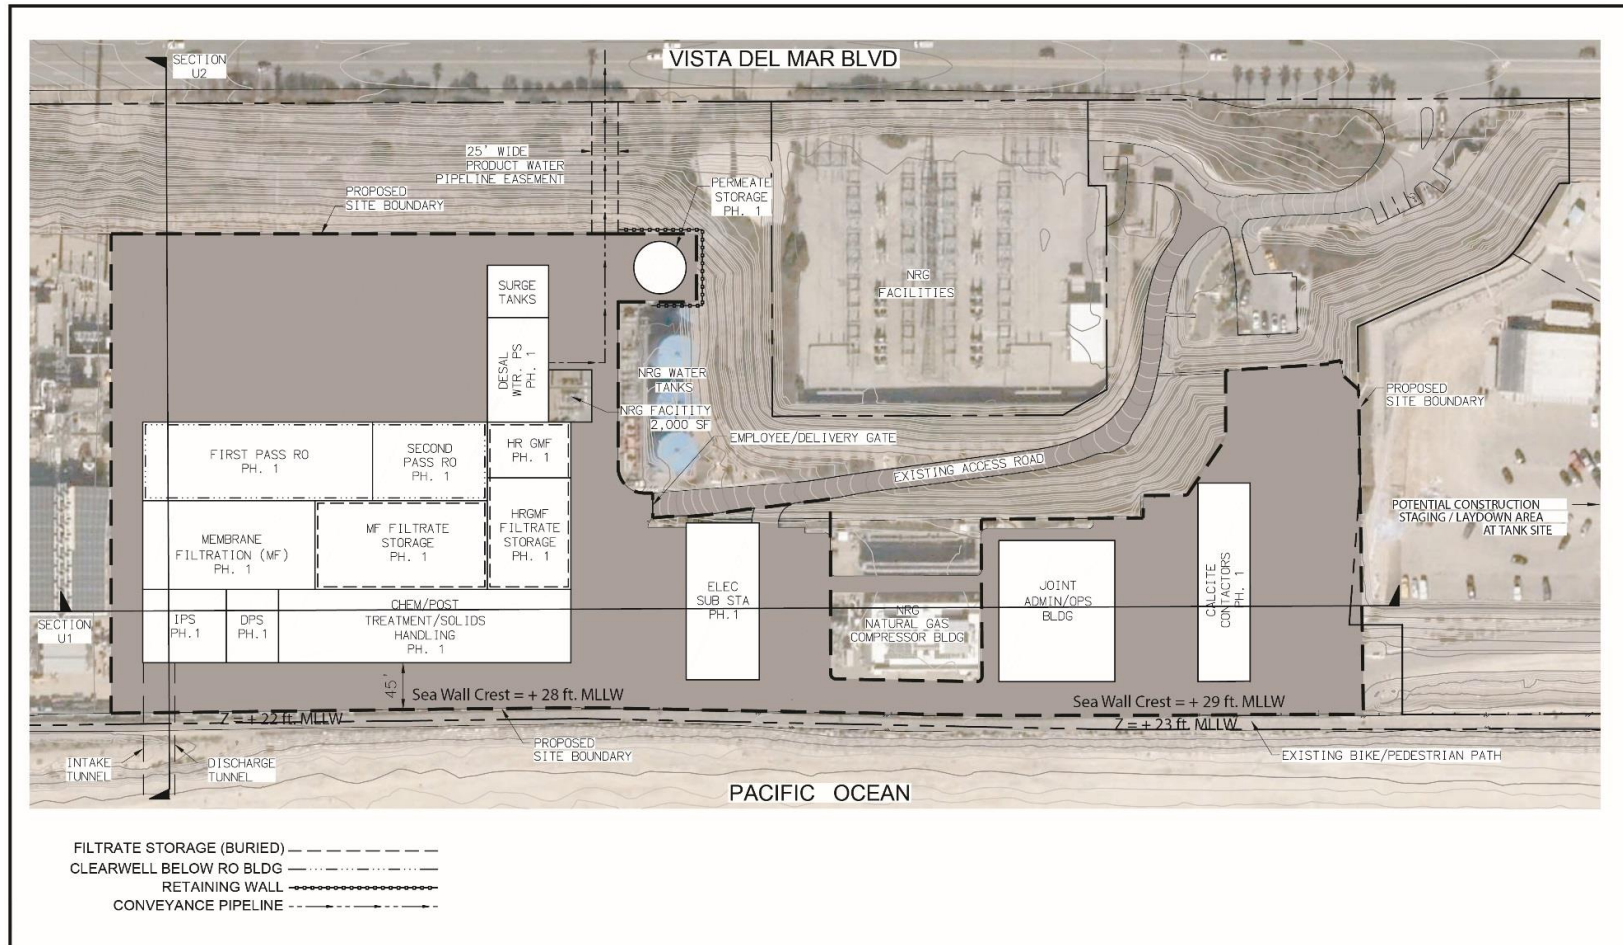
Component layout for the 20-mgd scale West Basin Desalination Project at the ESGs North site.
